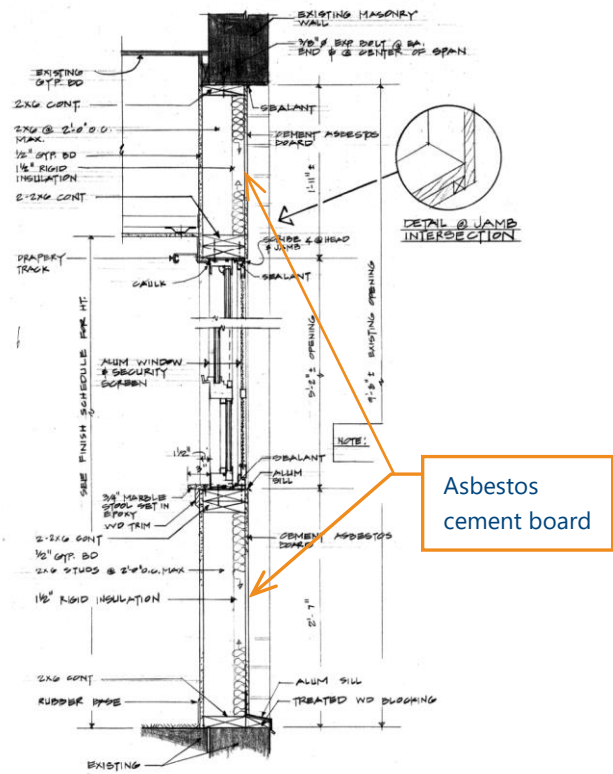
Section through the 1<sup>st</sup> floor window with asbestos cement board
